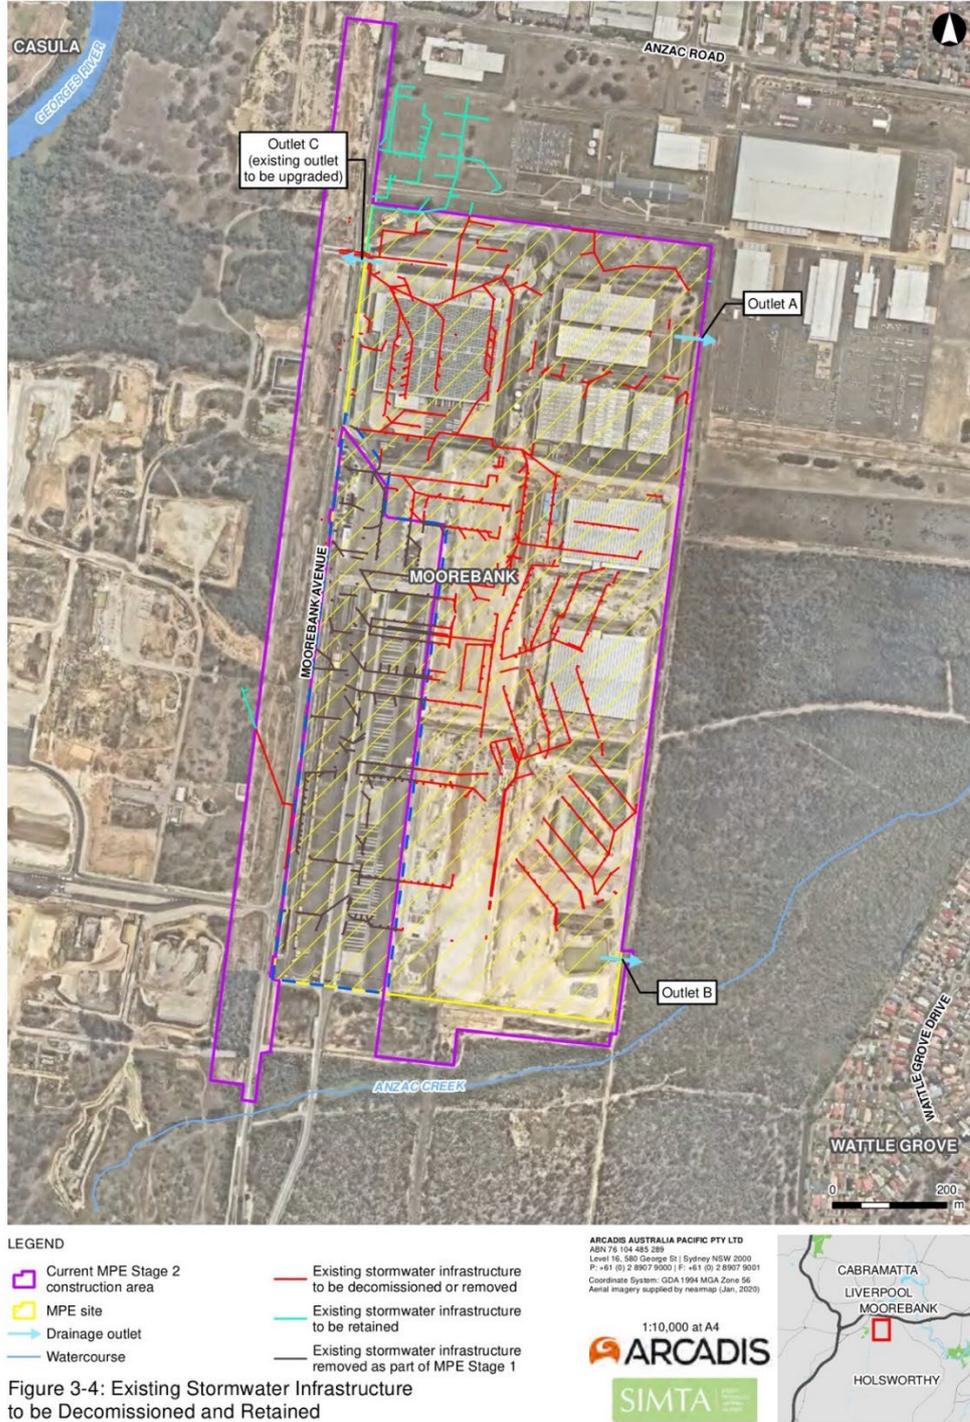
Existing Stormwater Infrastructure to be Decommissioned and Retained
